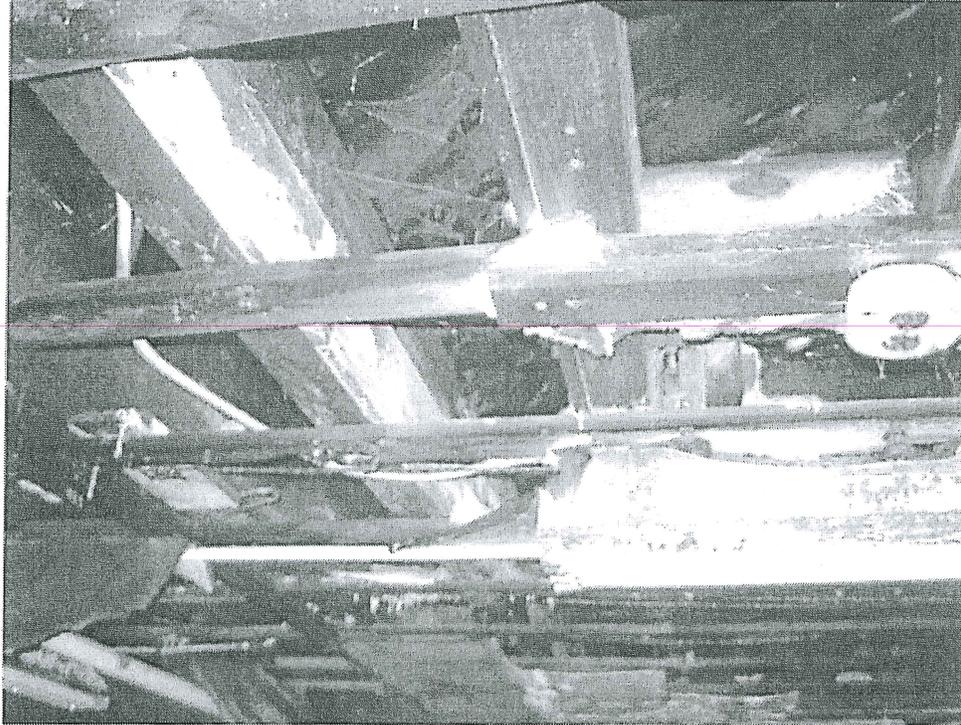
General view of white colored fruit bodies at the first floor framing
